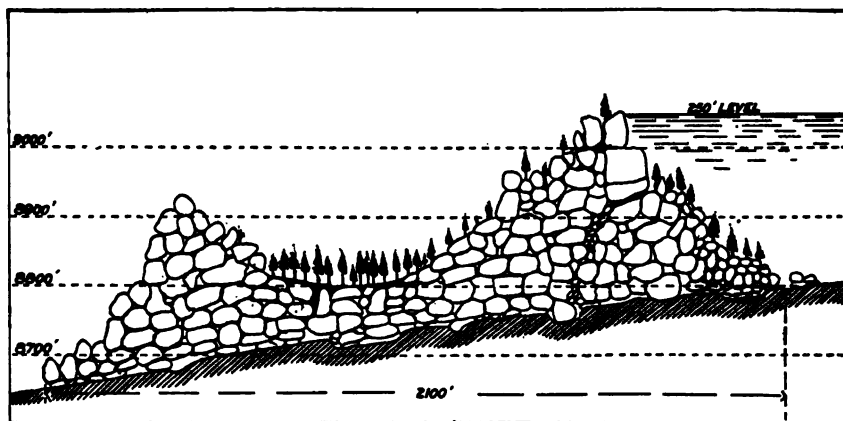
SKETCH OF LONGITUDINAL SECTION OF LOST CANYON NATURAL DAM
